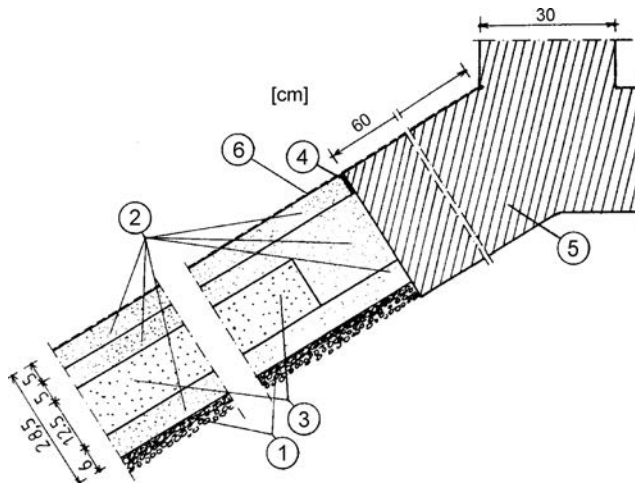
Joint of sandwich construction of the lining along with concrete parapet wall. (1) Bituminous stabilisation; (2) watertight asphaltic concrete; (3) drainage layer of porous asphalt; (4) joint sealed with mastic; (5) concrete mole extended towards the facing along the slope of dam; (6) finishing coat.
